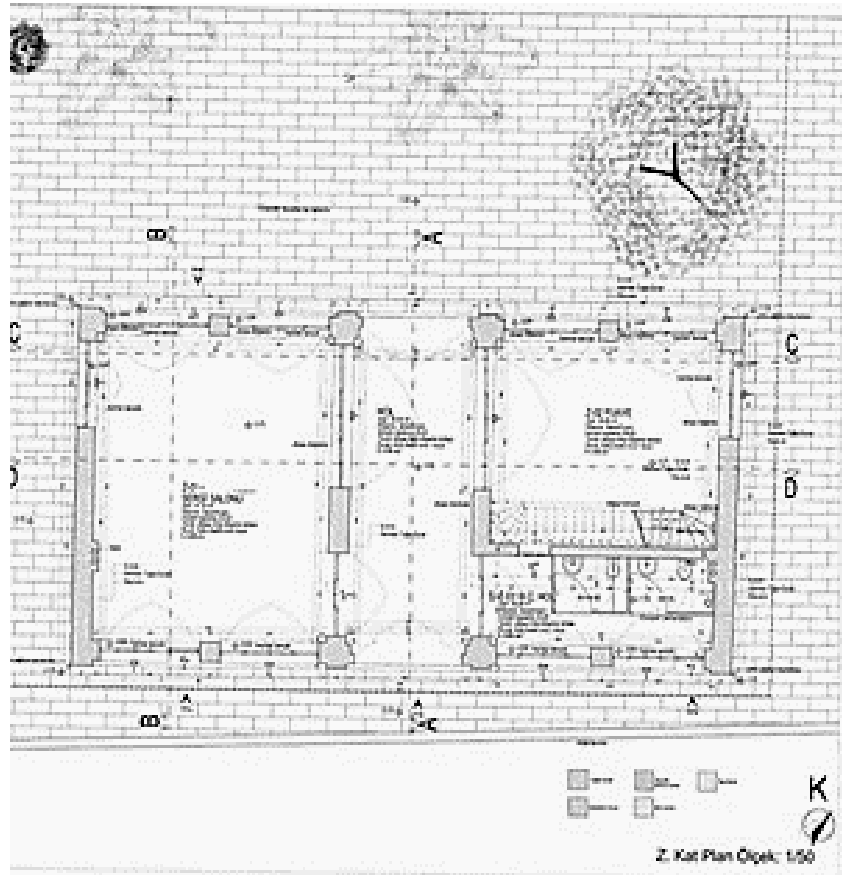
Ground Floor Plan (Restoration Project), [Bozdağ Architecture Company] [25]
